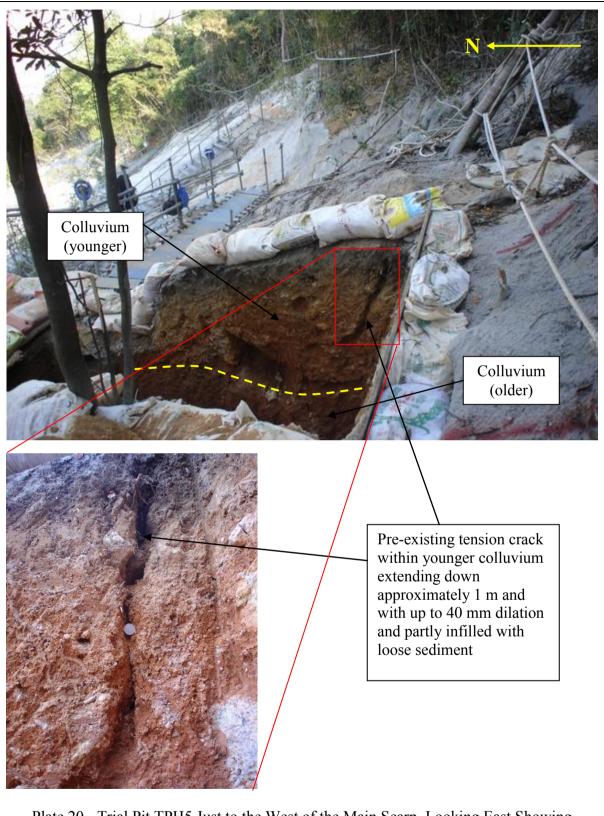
Trial Pit TPH5 Just to the West of the Main Scarp, Looking East Showing a Tension Crack Exposed within Colluvium (Photograph taken on 3 December 2008)
